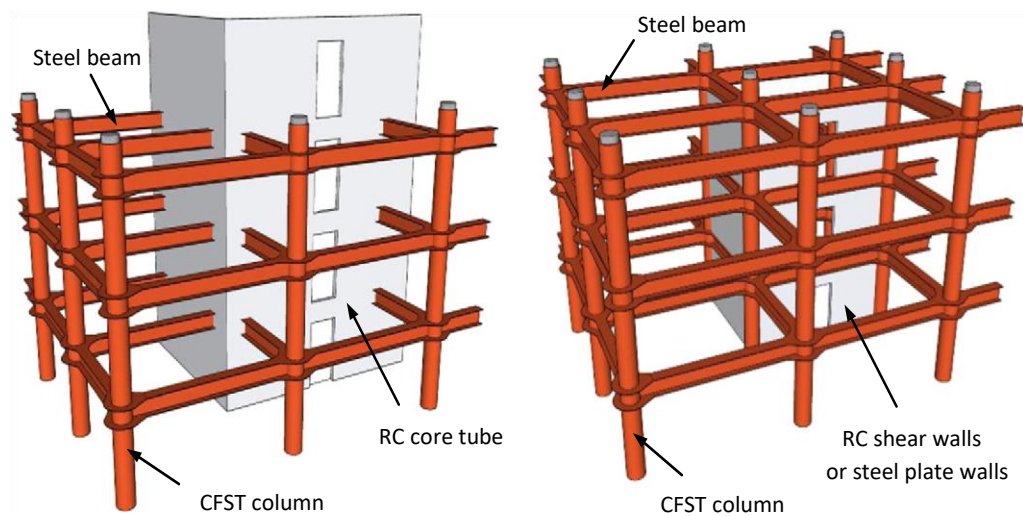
Existing CFST Hybrid Structural Systems (Han et al. 2014)
